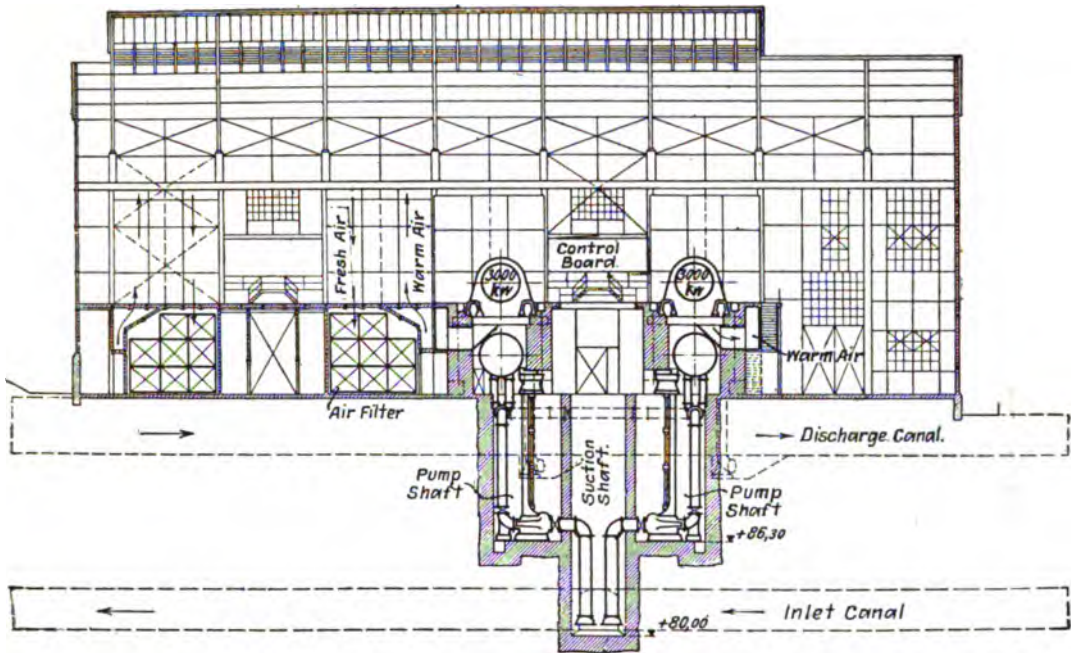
Vereeniging Power Station. Longitudinal Section through Engine Room. Scale, 1 to 500.
